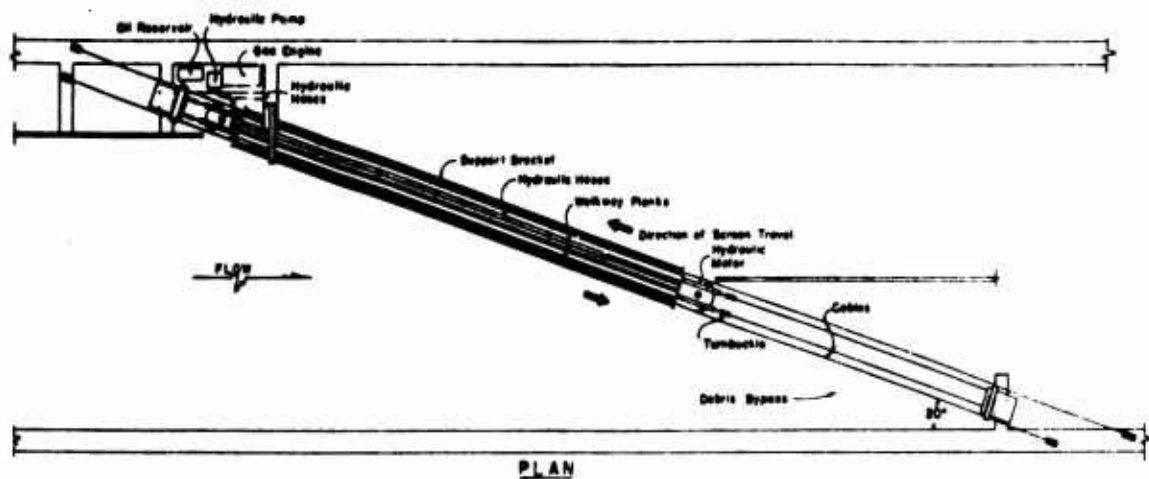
PLAN VIEW OF THE TRAVELLING DEBRIS SCREEN⁽¹⁾
